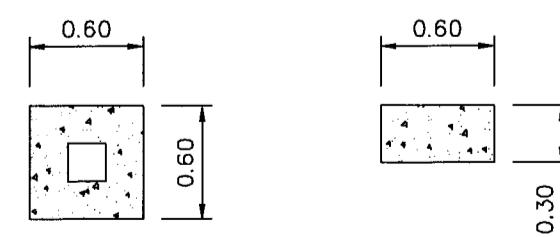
DETAIL CONCRETE POLE NO.1 (FRONT VIEW)
